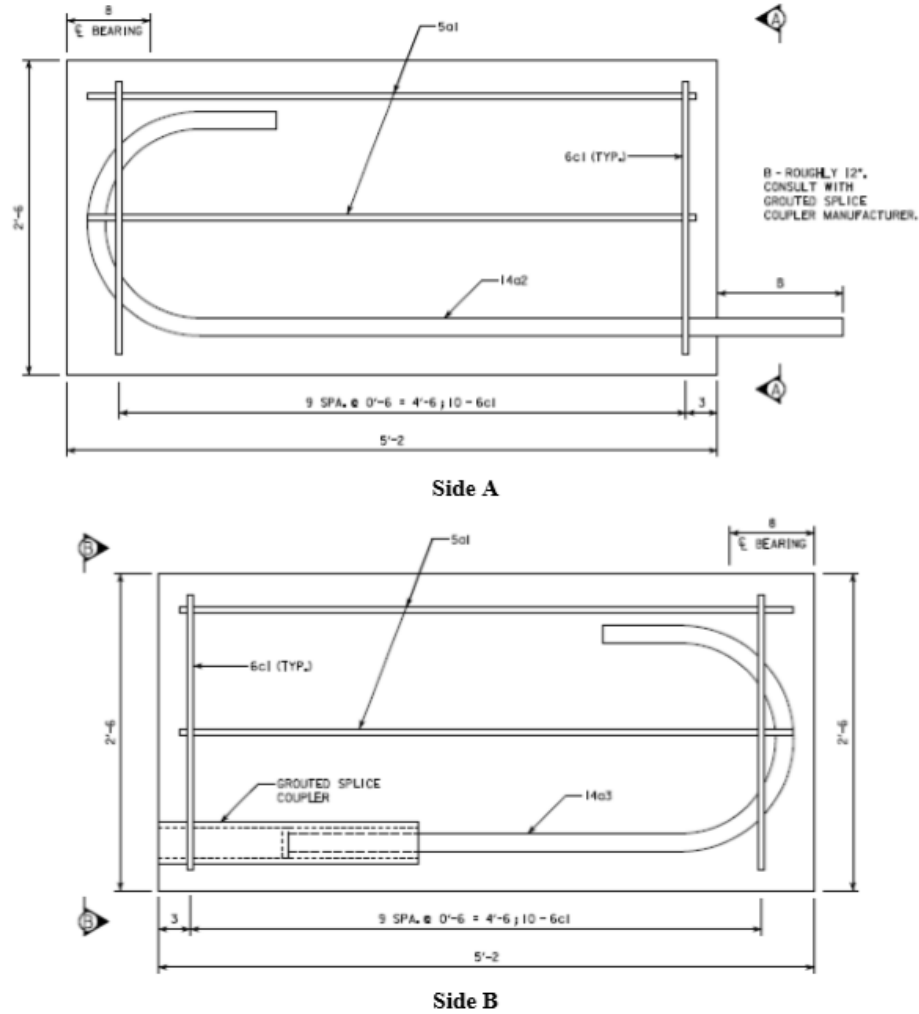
Grouted coupler specimen plan view.* (Hosteng, Phares, Abu-Hawash, Bierwagen, & Nelson, 2015)
